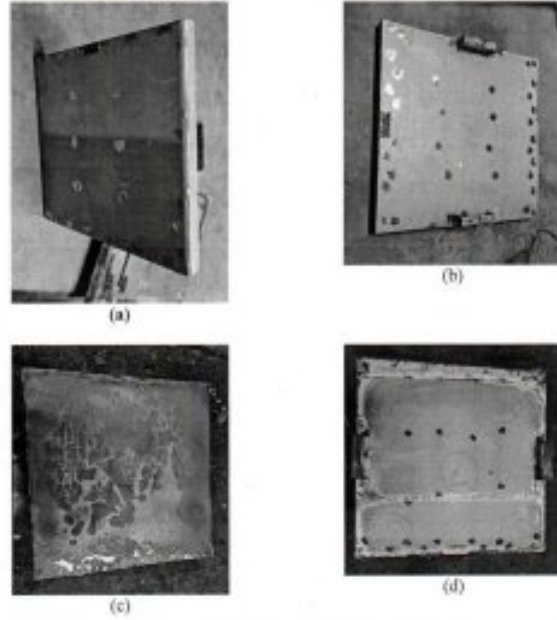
Photograph of (a, b) the sample supplied, (c) exposed inside surface after test, and (d) outside surface after test
